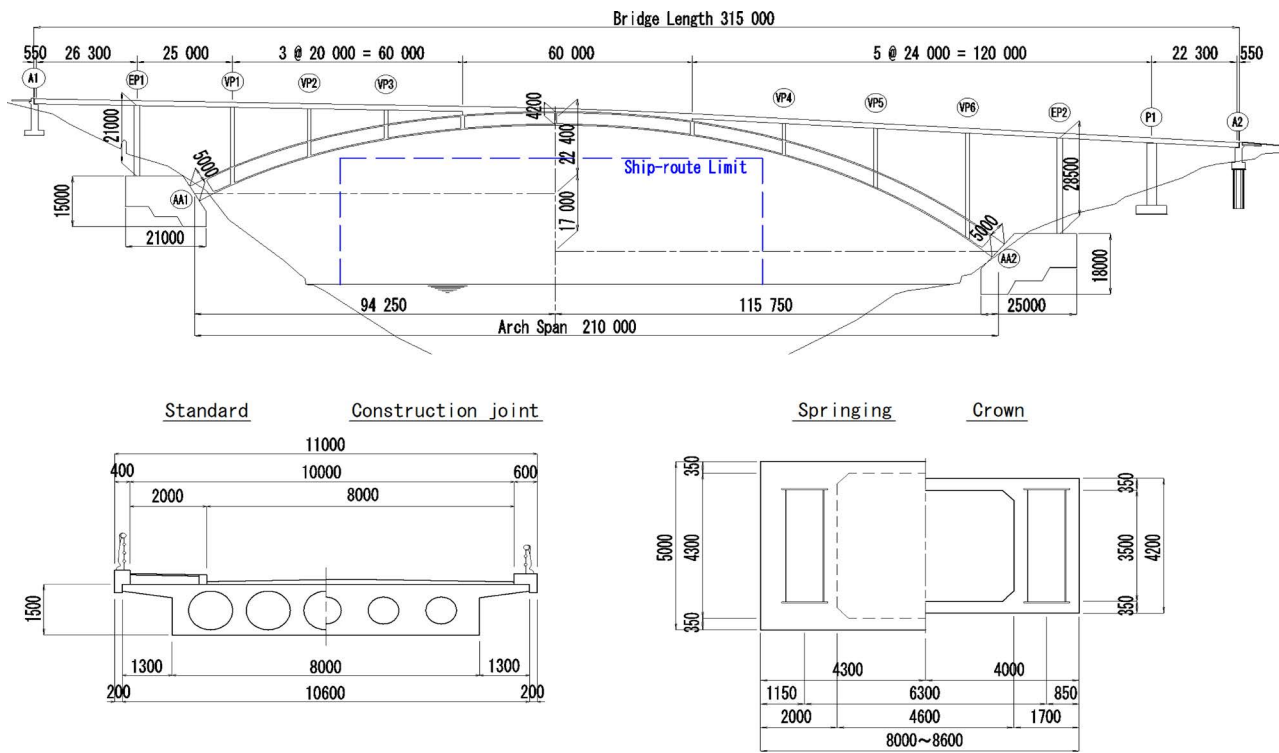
Elevation and cross sections of the Warumi-Ohashi Bridge
